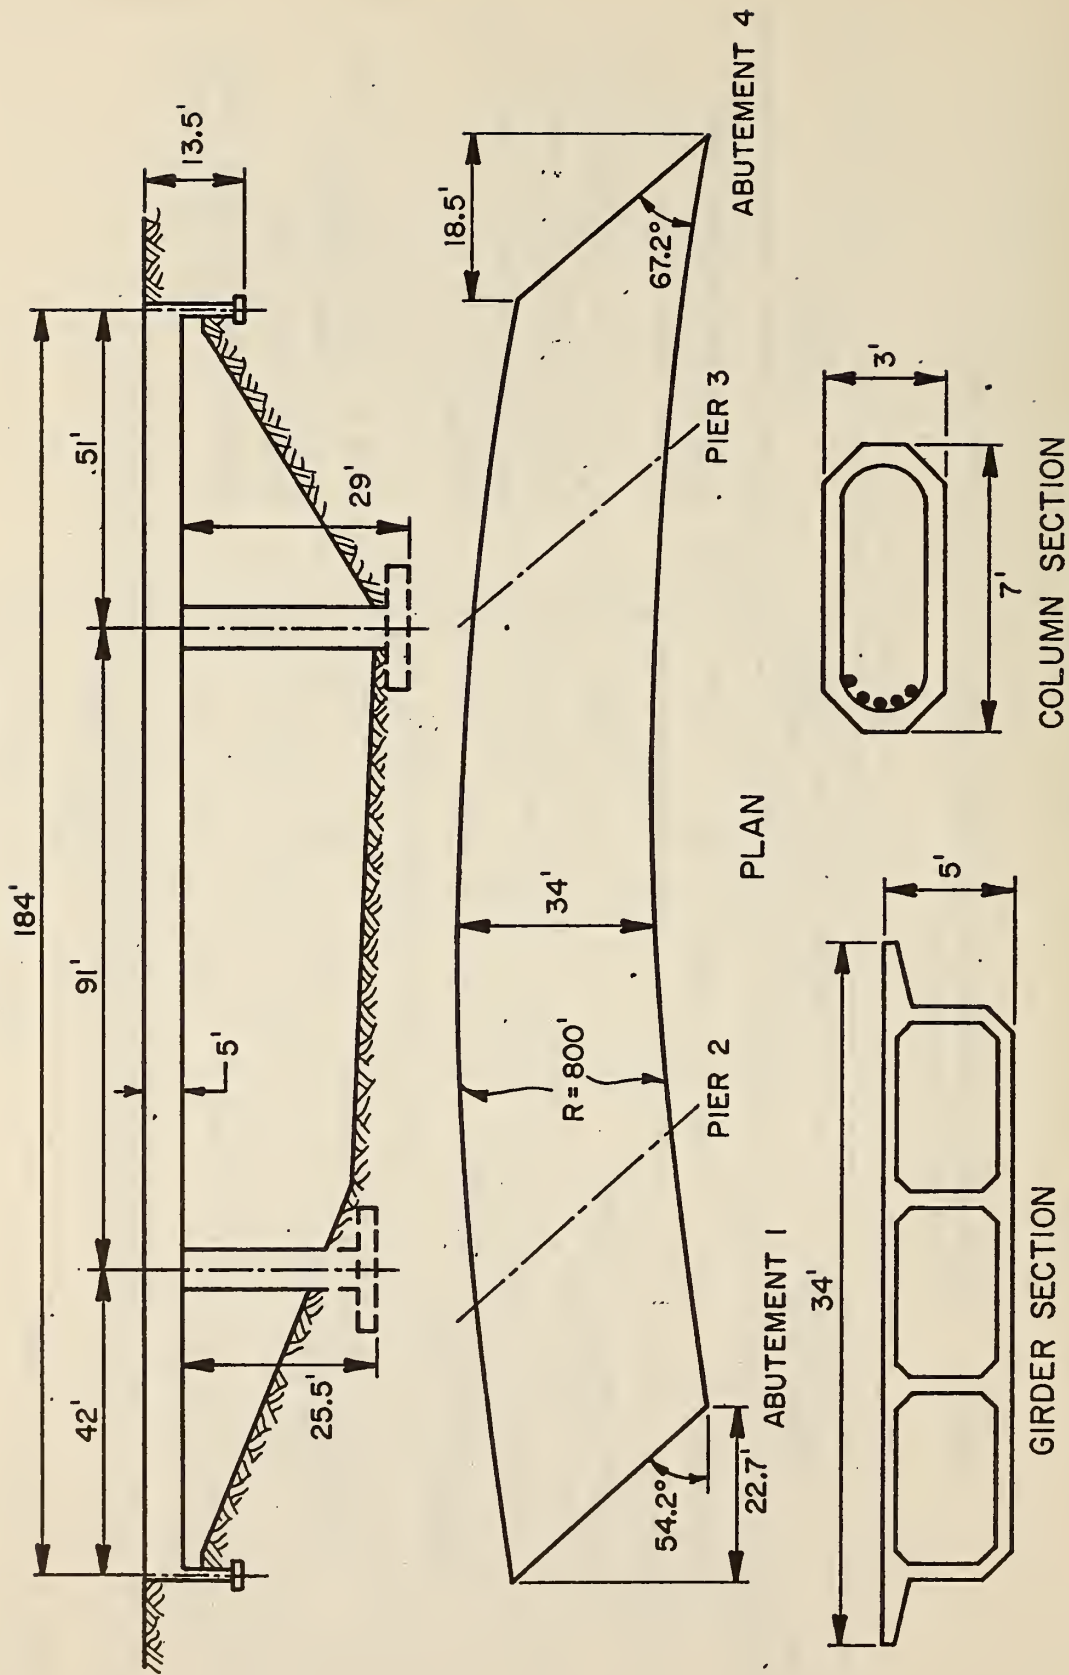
GENERAL PLAN OF NORTH CONNECTOR UNDERCROSSING
